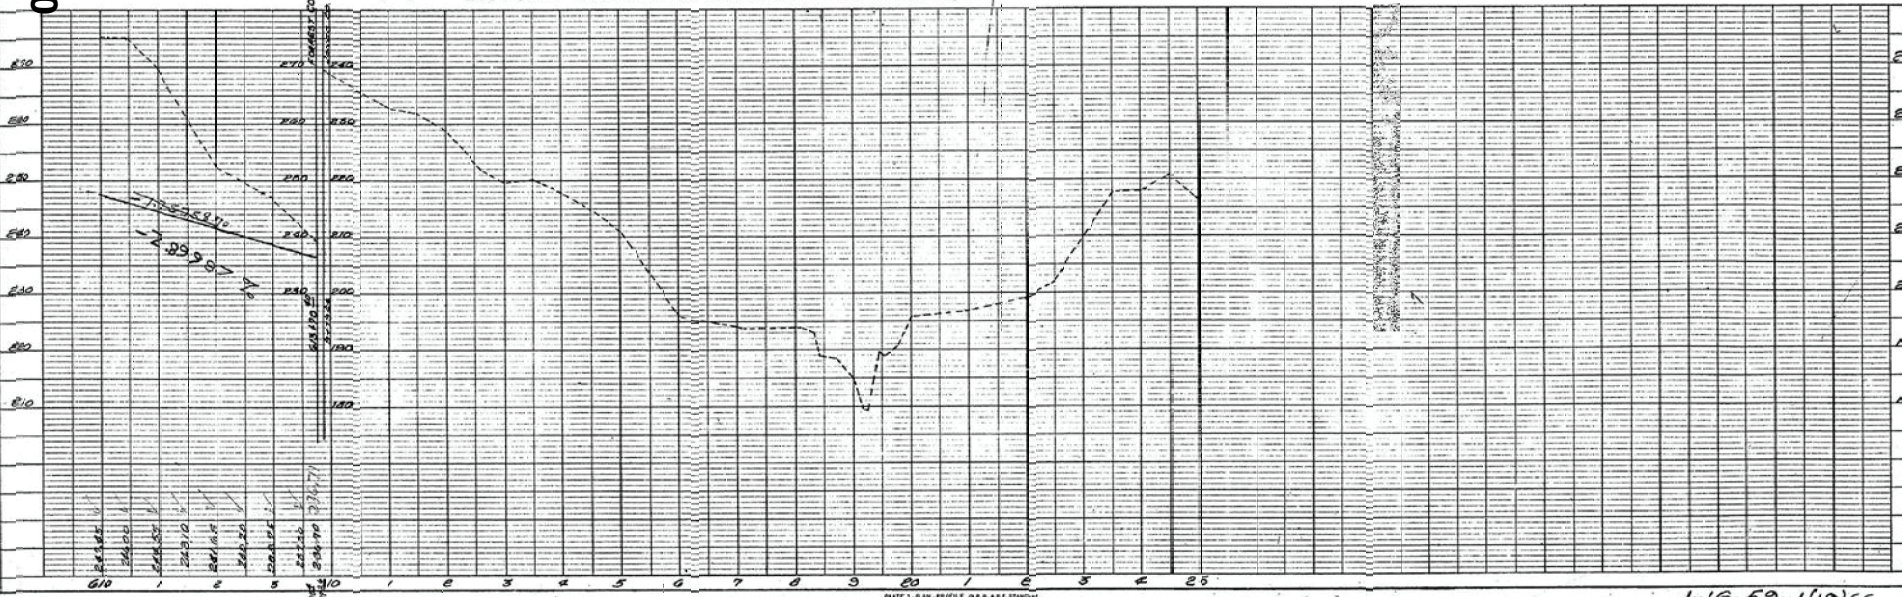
PLAN PROFILE O.P.A. & R.E. STANDARD
